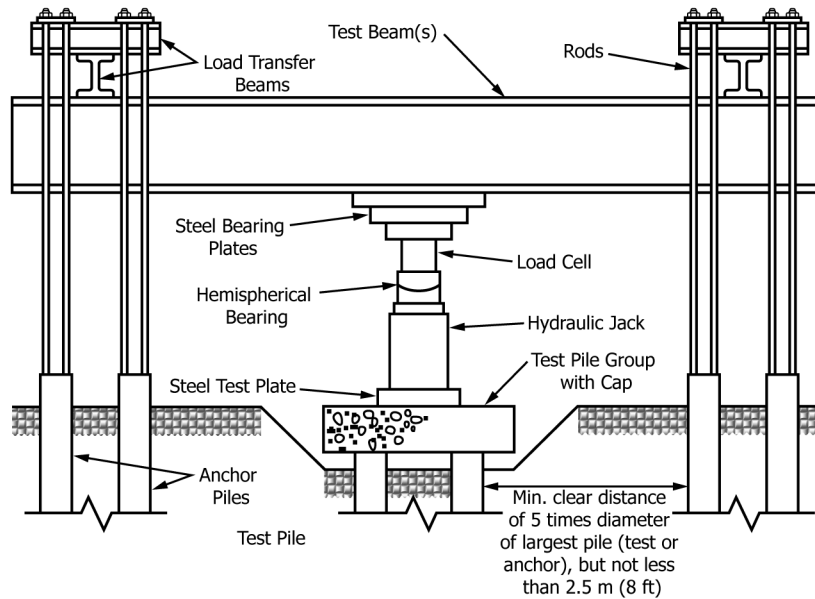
Schematic Setup for Applying Loads to Pile Using Hydraulic Jack Acting Against Weighted Box or Platform of Hydraulic Jack on a Pipe Group Acting Against Anchored Reaction Frame
